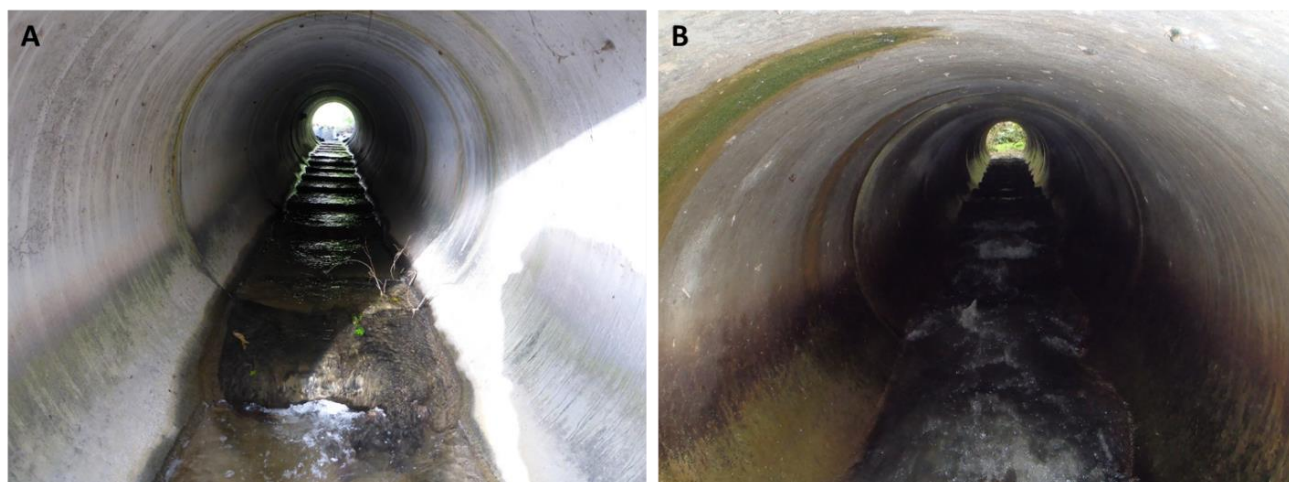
Culvert under Upper Kingston Road. A) at low flow. B) at high flow.
